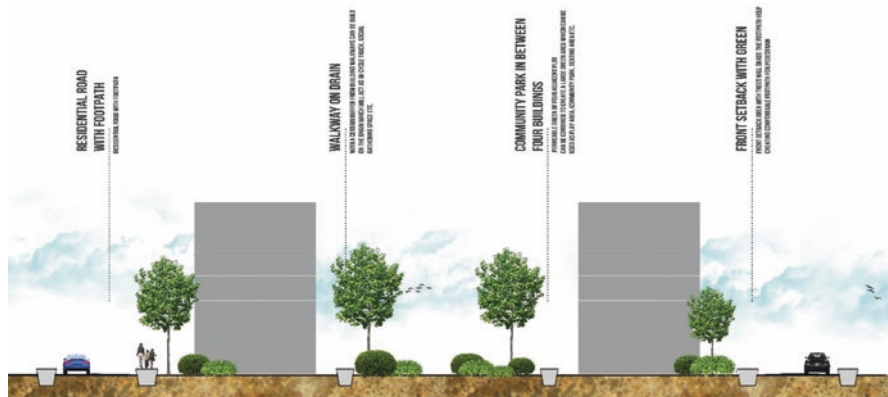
Section (only setback area) of proposed building of plot without boundary wall
